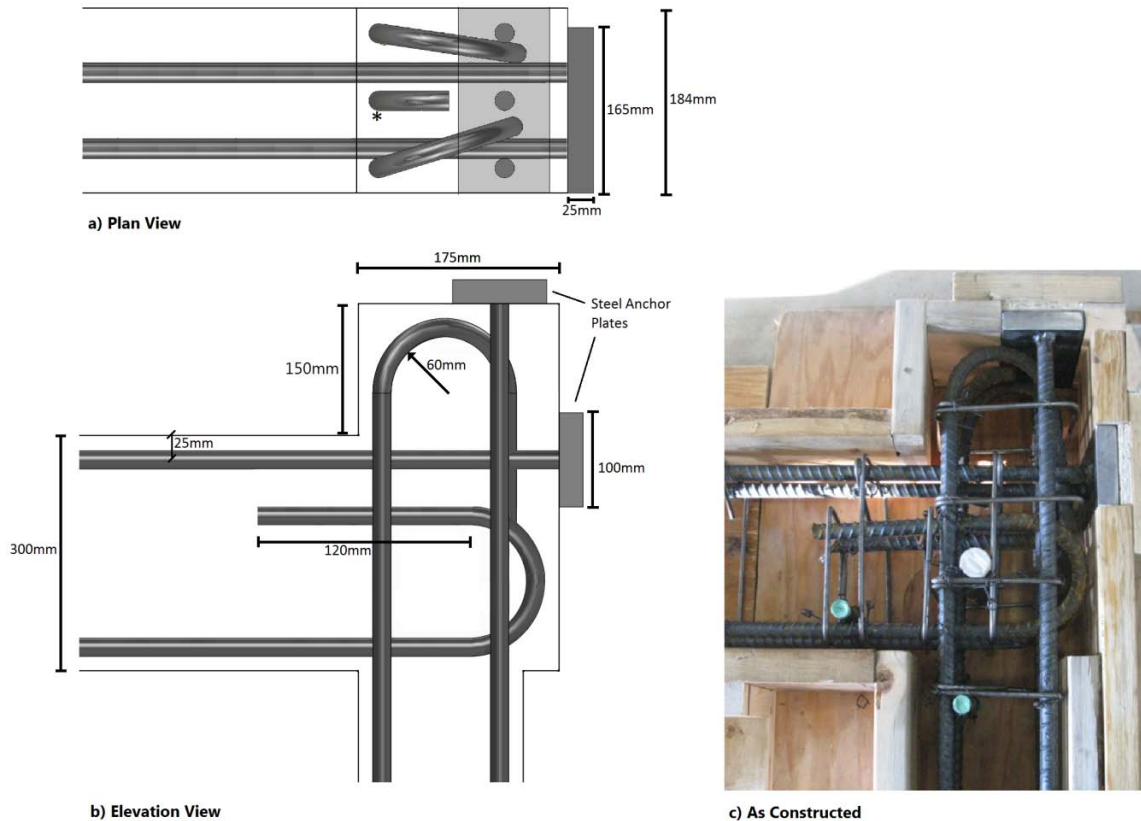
Corner Reinforcement Detailing: a) Top View; b) Front View; c) As Constructed
